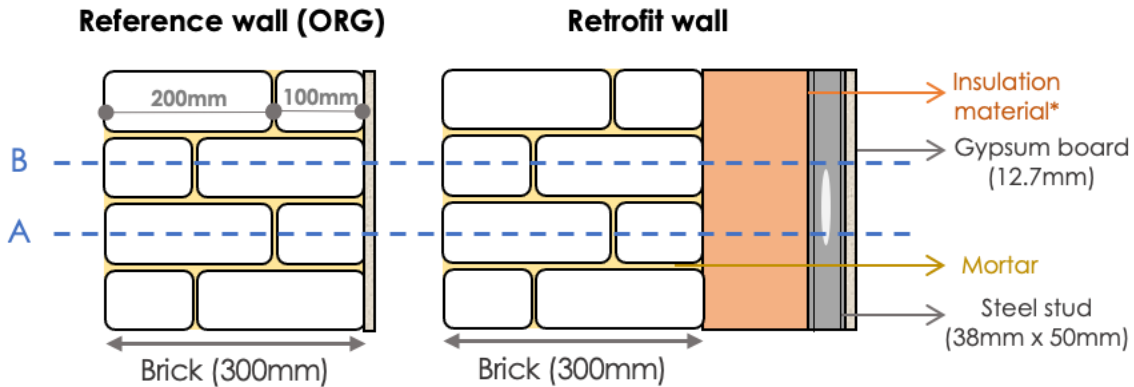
Configuration of typical brick masonry wall assemblies: reference wall (ORG) (top left), and internally insulated wall (top right).
